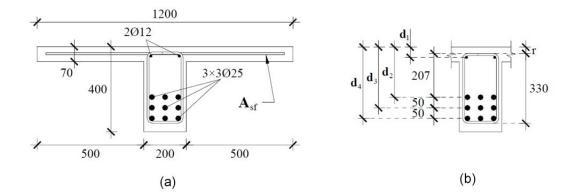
Cross section: (a) Geometry and longitudinal reinforcement arrangement; (b) Longitudinal reinforcement locations. Units: mm.
